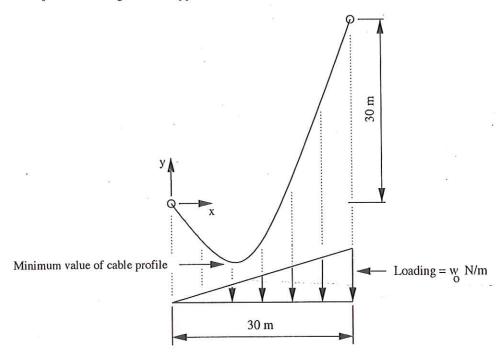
Elevation view of a swing bridge carrying a triangular loading.
